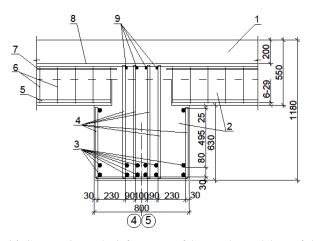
Construction and reinforcement of the crossbar and the roof slab:
